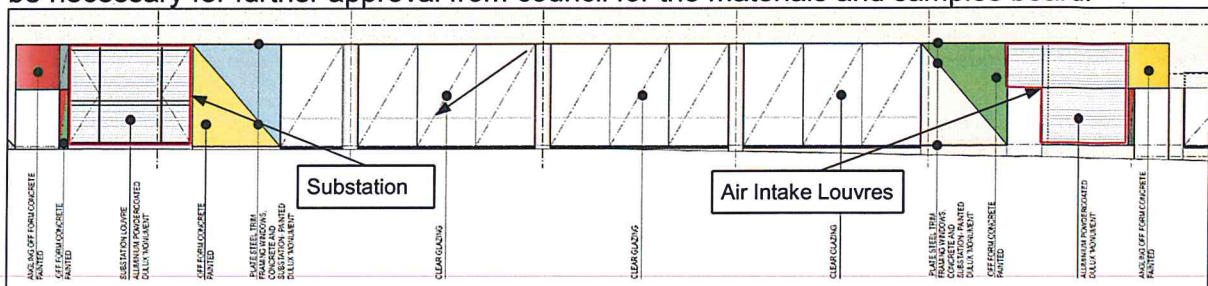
Part Ground Level Elevation Details (Thomas Street)
